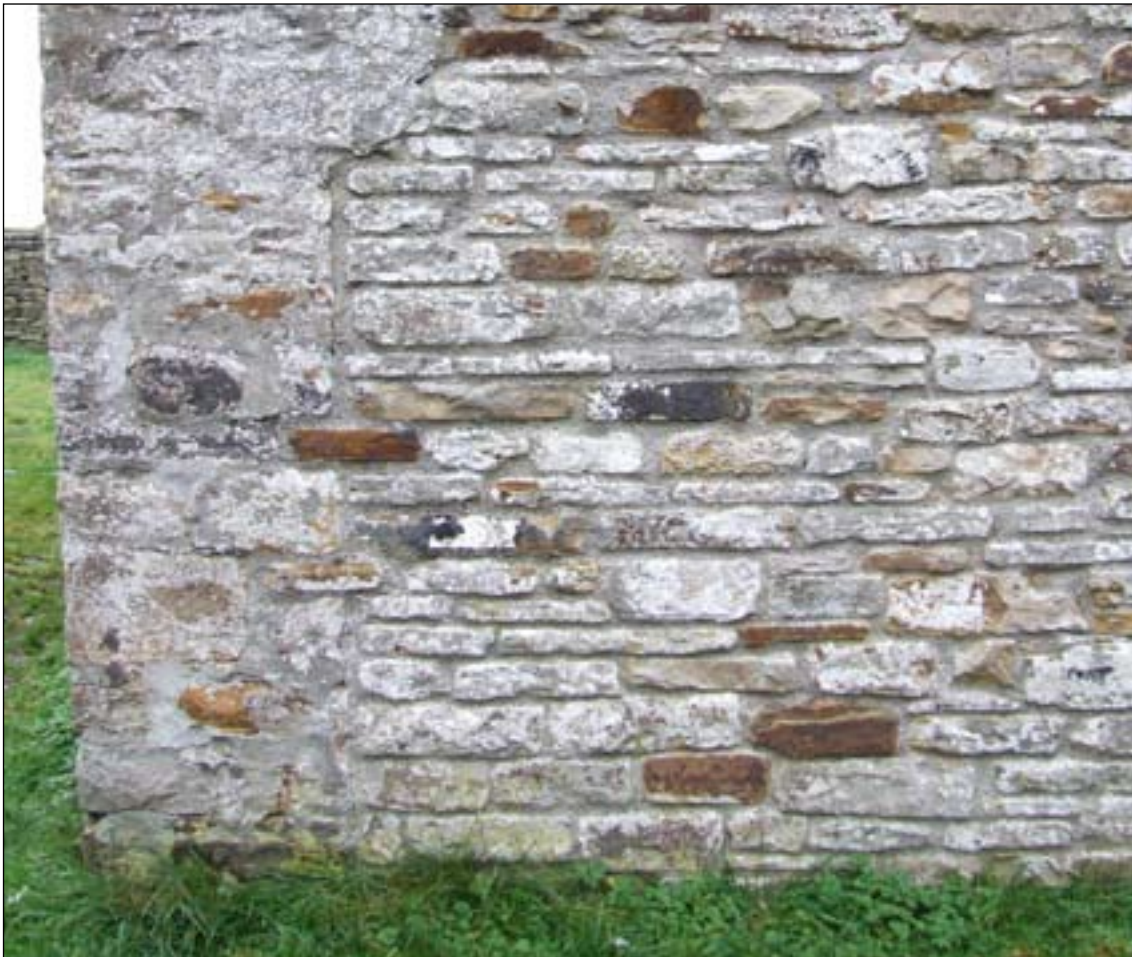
The south-western corner of the mineshop, showing the straight joint denoting one of the original ground-floor doorways. [DPI35350]
